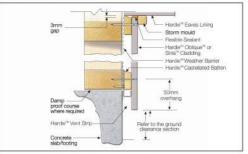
SLAB/EAVE JUNCTION DETAIL
